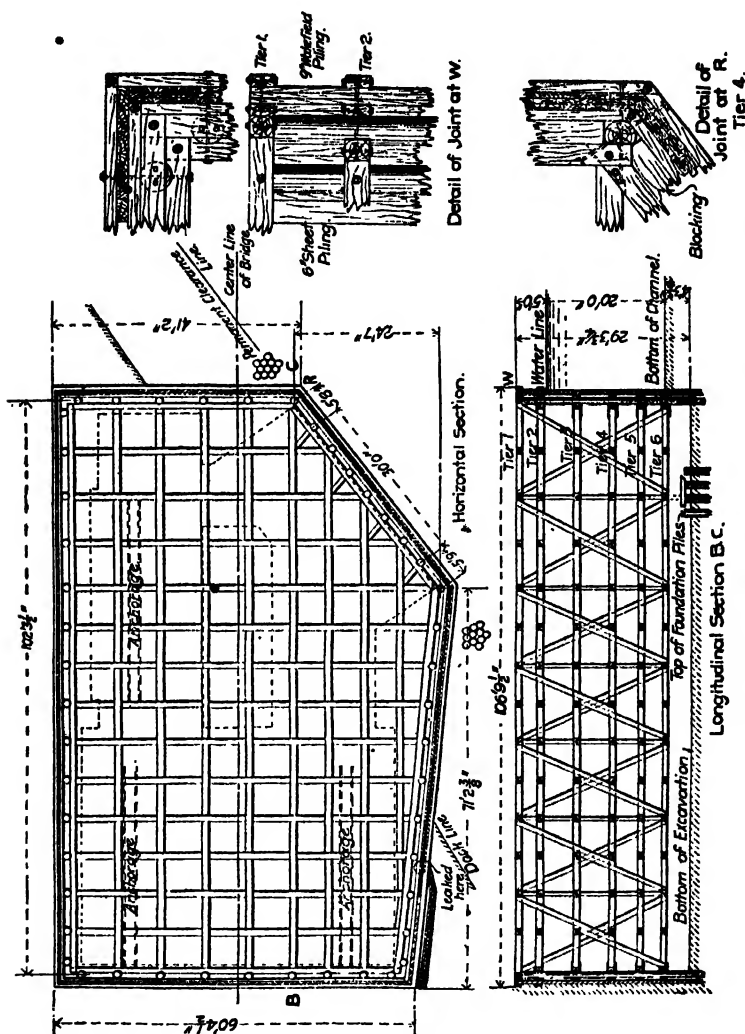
Cofferdam for Substructure of Rolling Lift Bridge at Taylor Street, Chicago.
